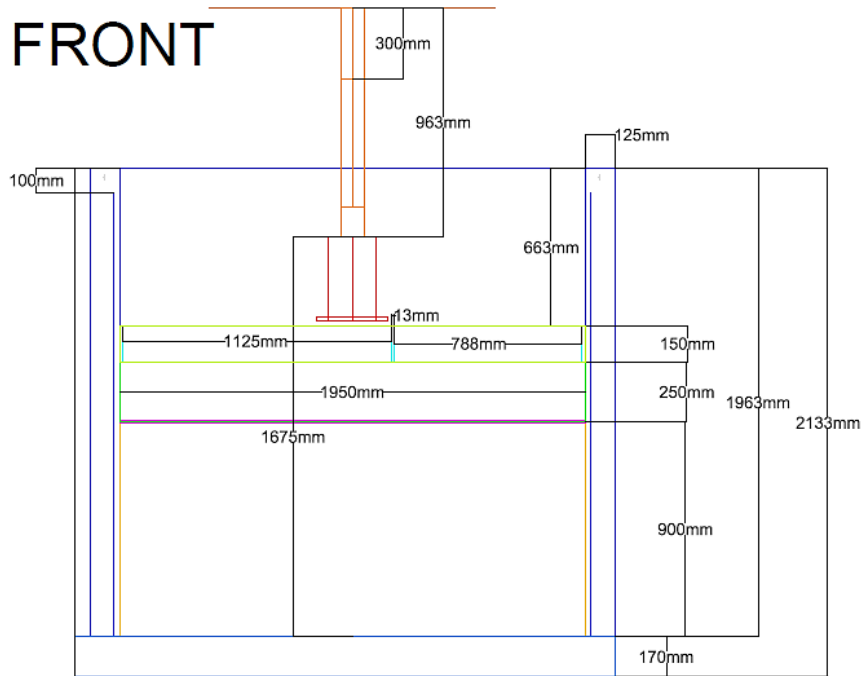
Large Box Layout with Concrete Slabs (Front View)
